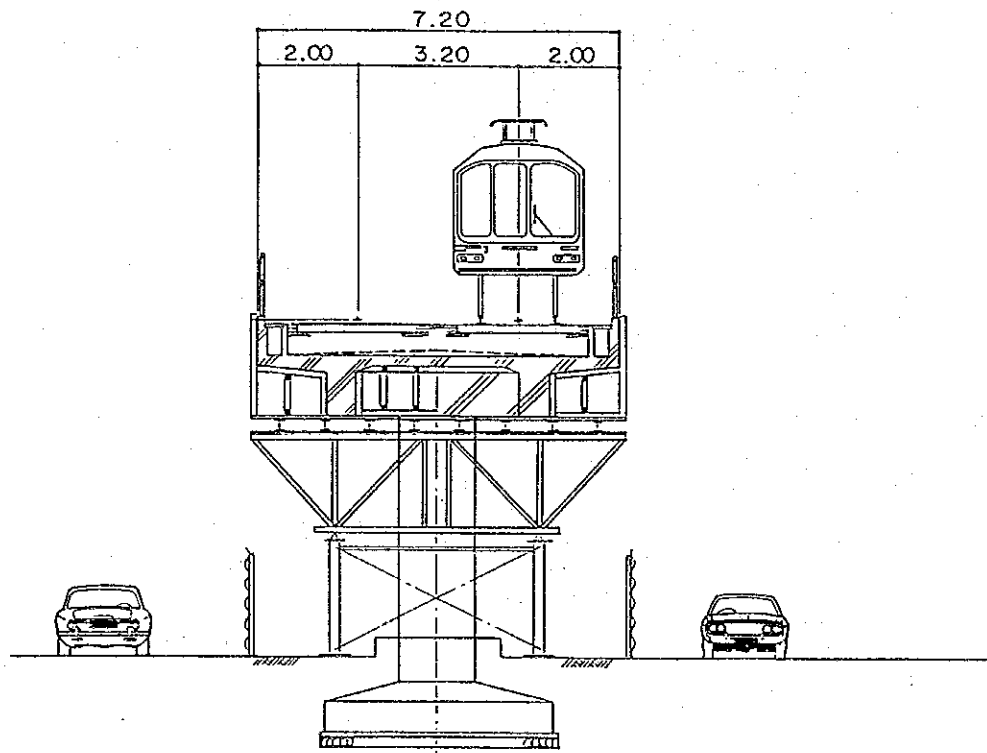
Construction Diagram of Elevated Bridge Body
